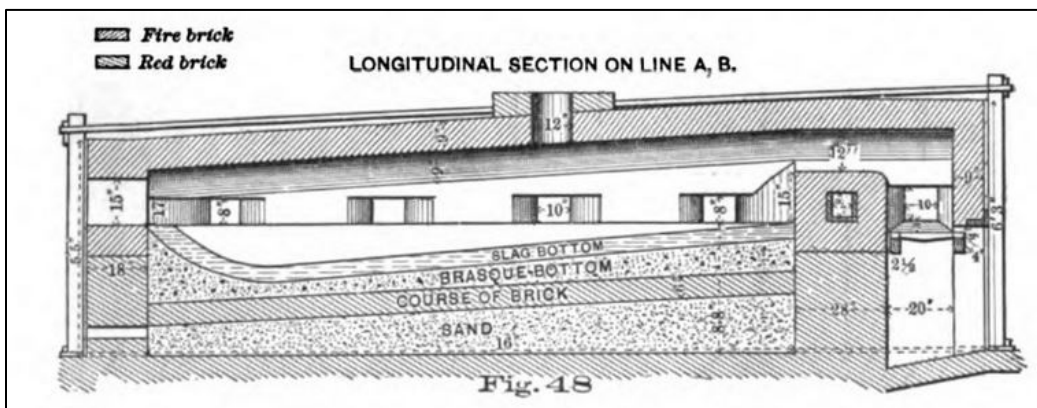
Cross-section of reverberatory furnace showing construction of hearth floor. Illustration from Hofman 1893:163.
